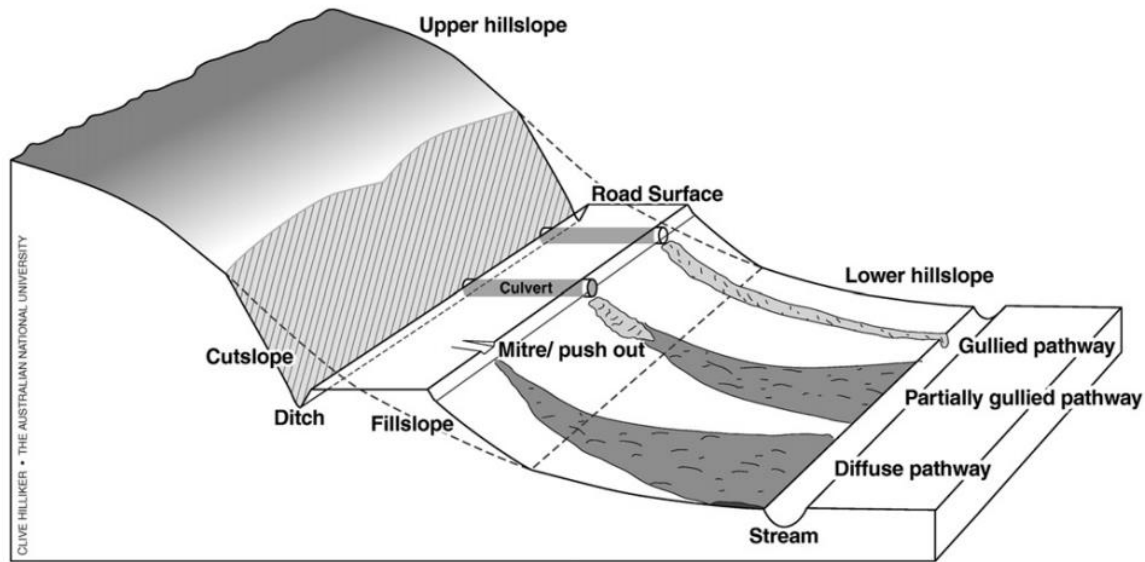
CROSS SECTION AND FEATURES OF A TYPICAL CUT-AND-FILL LOGGING ROAD (SOURCE: FU, NEWHAM, & RAMOS-SCHARRON, 2010).
